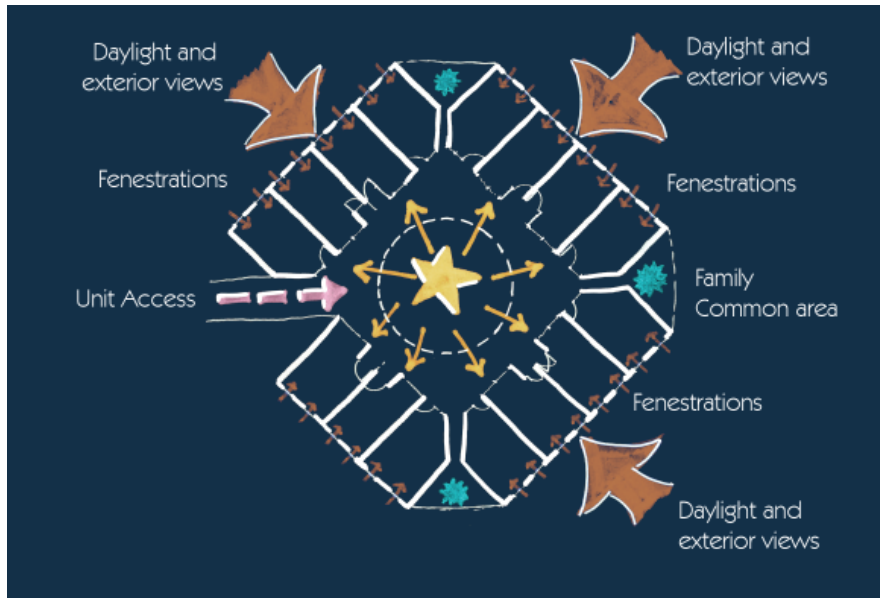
Floor plan diagram of NICU conditions at Rainbow Babies.
